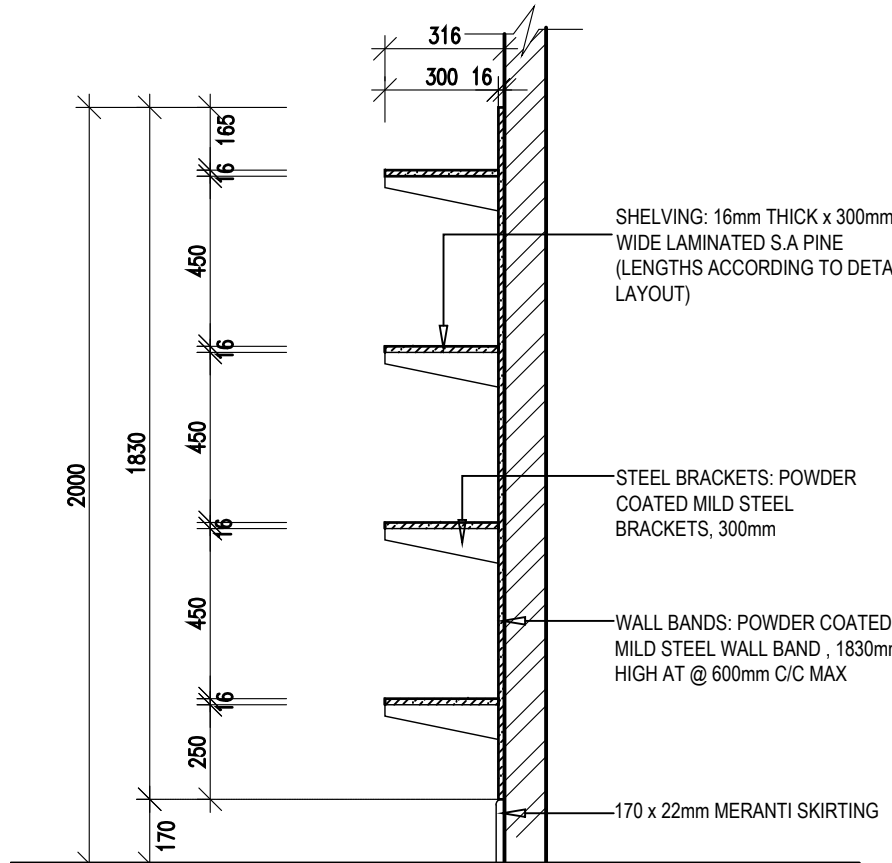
STAFF KITCHEN-SECTIONAL ELEVATION B
